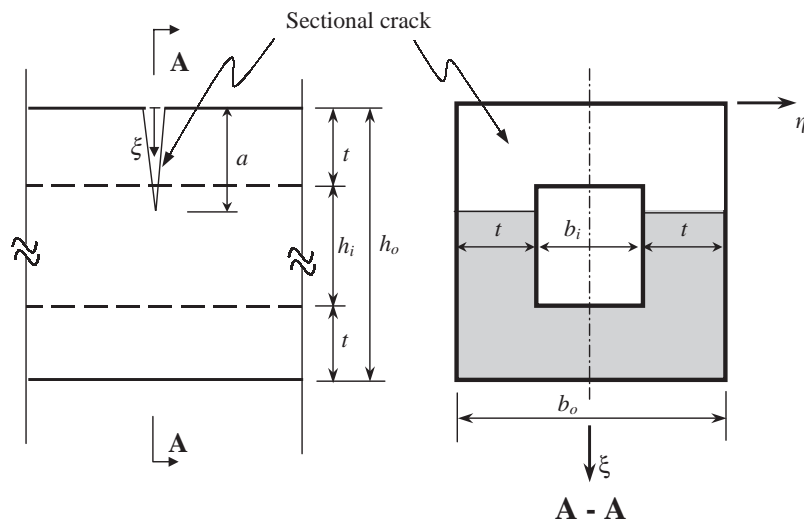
A sectional crack in a rectangular-hollow-sectional beam (Case 2).
